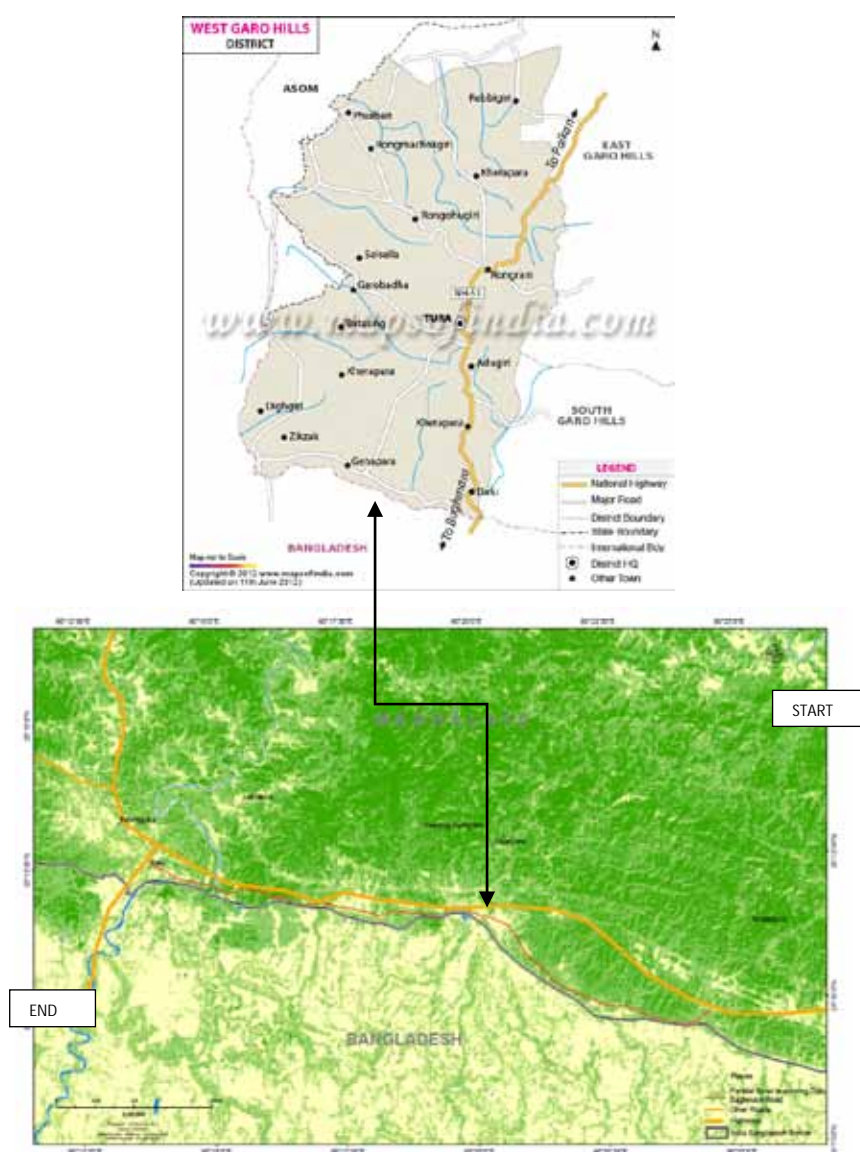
Alignment Plan Parallel Road to existing Dalu Baghmara Road
